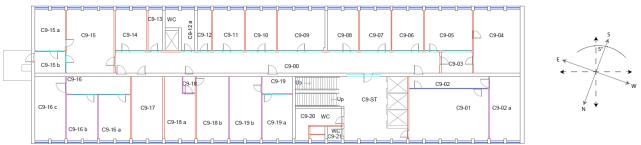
Typical floor arrangement (floors 1-12 of the FER skyscraper) and the building orientation.
